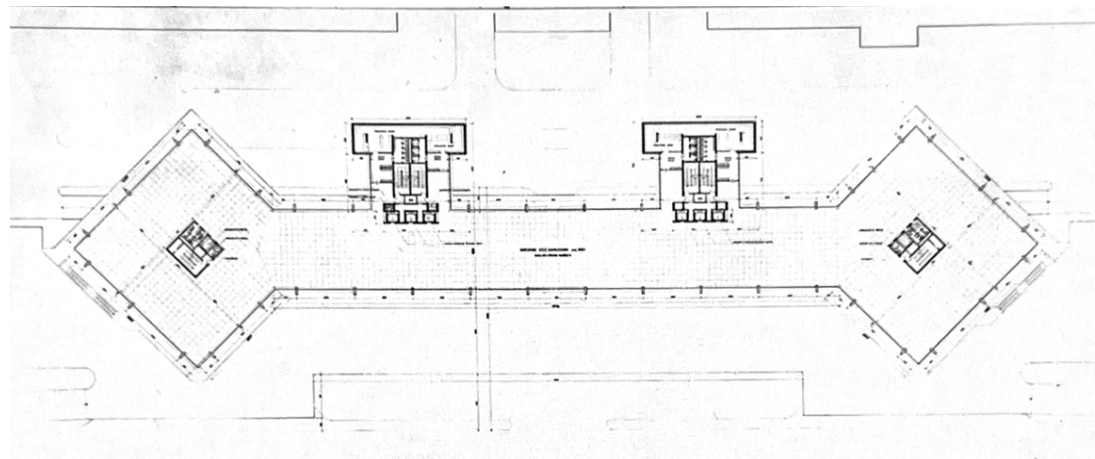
Alfa Romeo Office Building, Arese, 1968-74. Final plans, typical floor plan. Gardella Historical Archive, CSAC.
